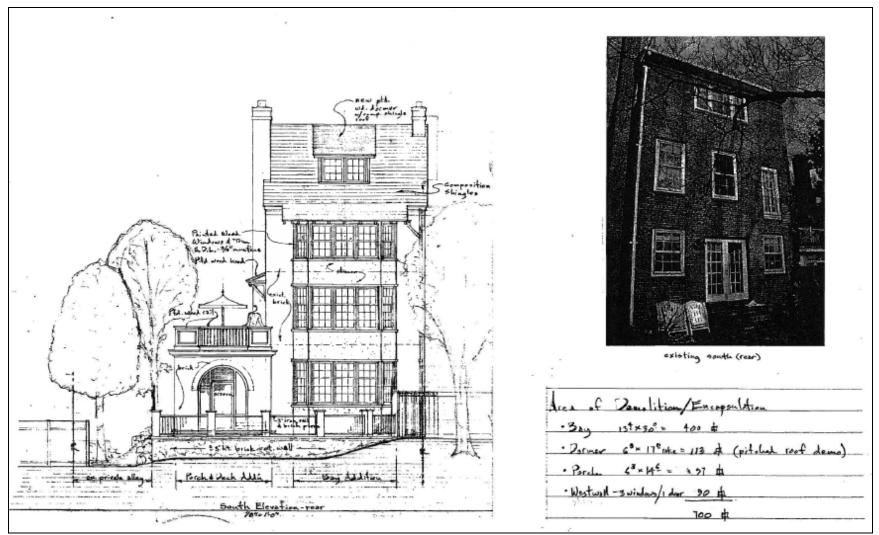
Proposed south (rear) elevation and chart of proposed demolition/encapsulation.
